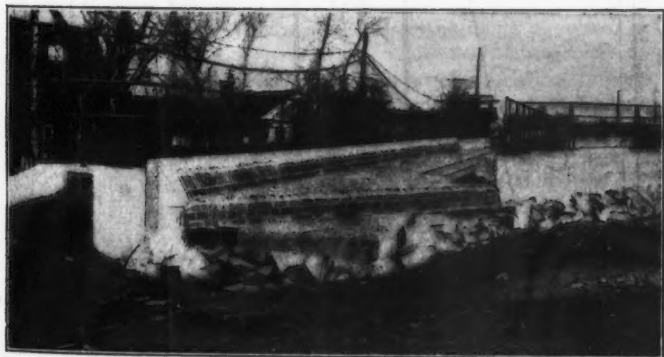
REINFORCED CONCRETE SLAB FLOOR, NOT IN CONTACT WITH GIRDERS.
